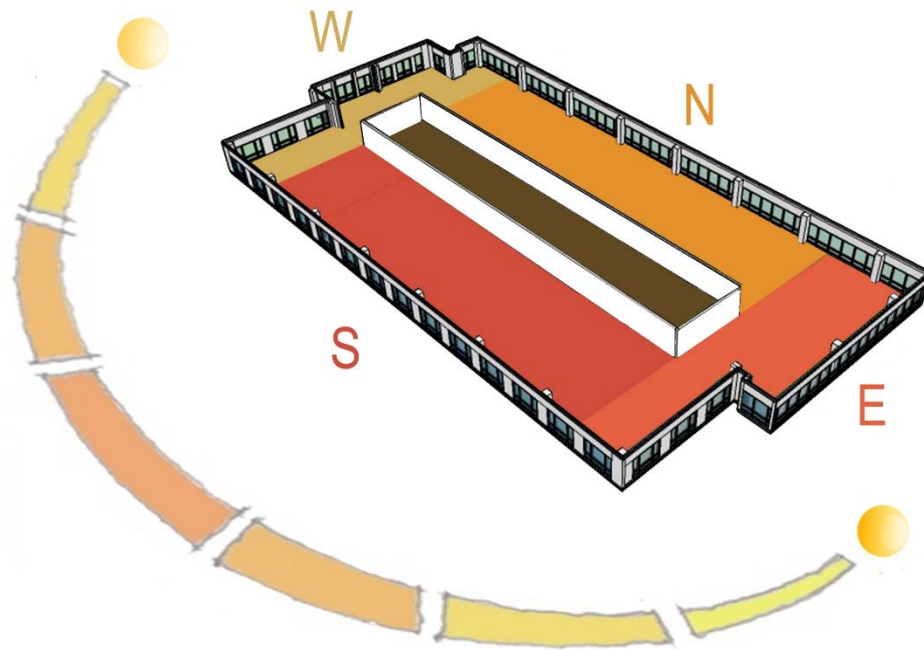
Generic Floor Plan - Location of Open Plan Daylighting Zones
